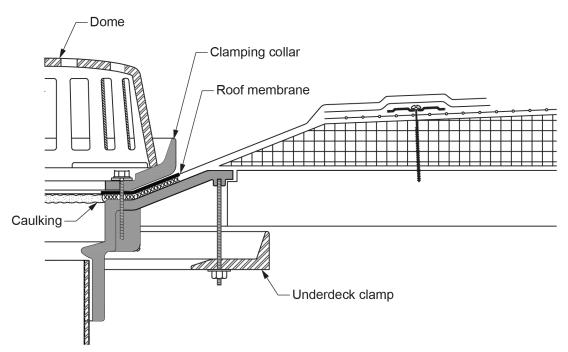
Complete installation of a roof drain. (Skilled Trades BC, 2021) Used with permission.
